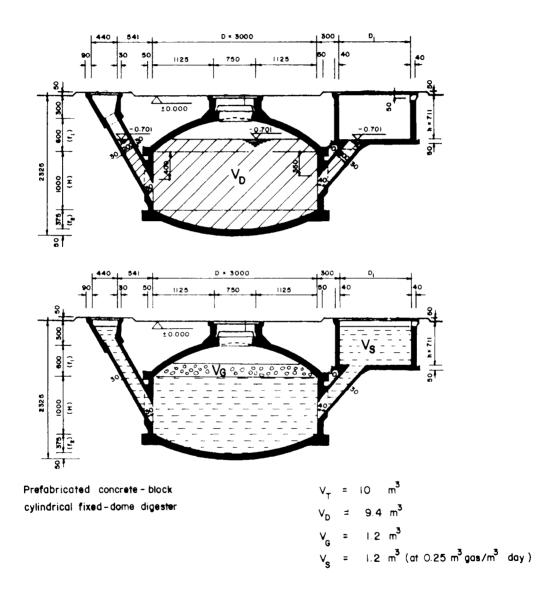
Prefabricated concrete-block cylindrical fixed-dome digester (adapted from 14)
